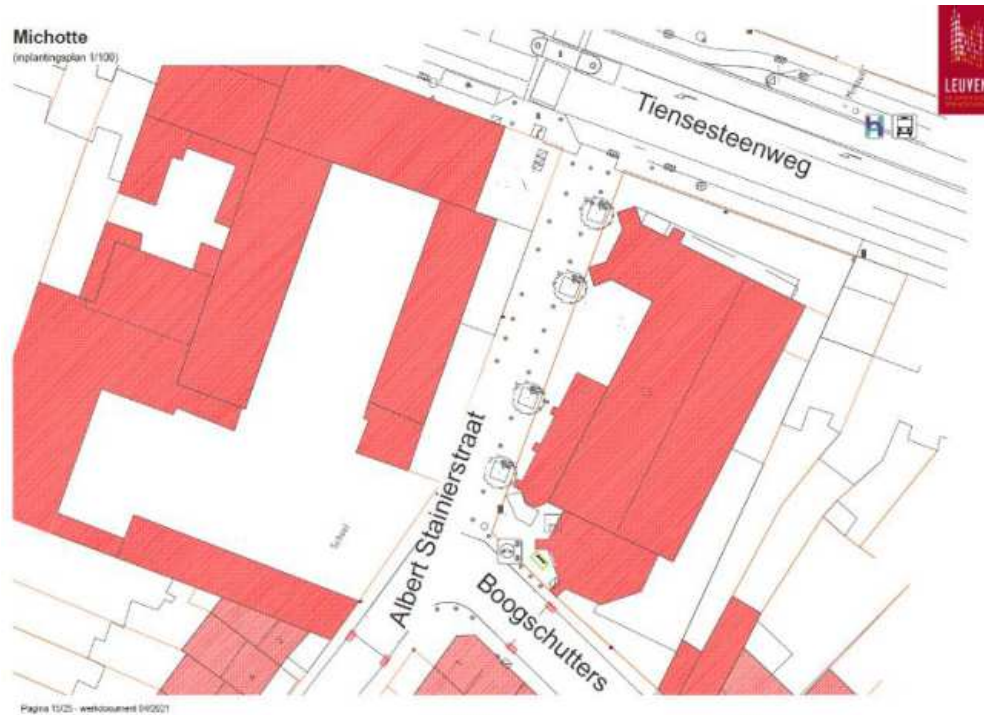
June 2021 – Site plan information pillar of eHUB Michotte, implemented since June 2021
